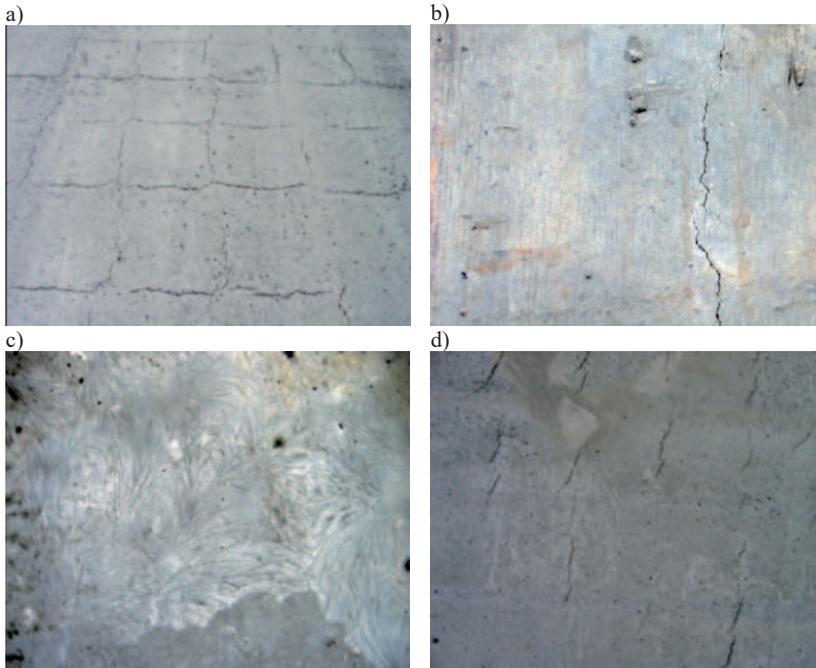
Effects of poor concrete care: a) cracks in the bridge slab due to plastic shrinkage, b) cracking of the tank wall due to contraction of the hardening, c) damage to the concrete surface due to freezing of fresh concrete, d) scratches in the bridge slab due to vibrations from the adjacent bay during concreting. *Source:* [4]
